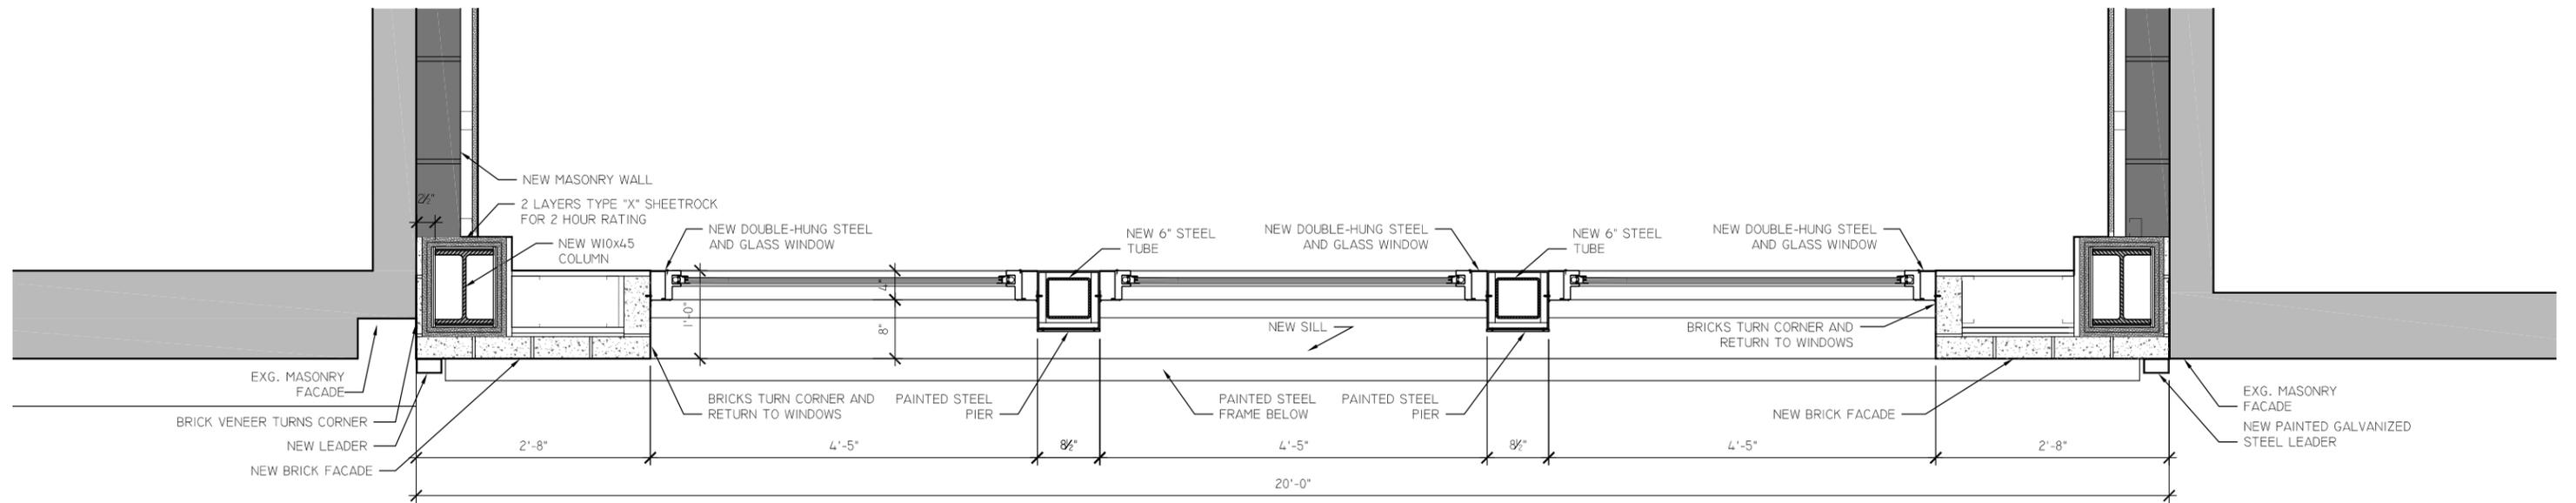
DETAIL SECTION - SPANDREL PANEL AND NEW STEEL WINDOWS
